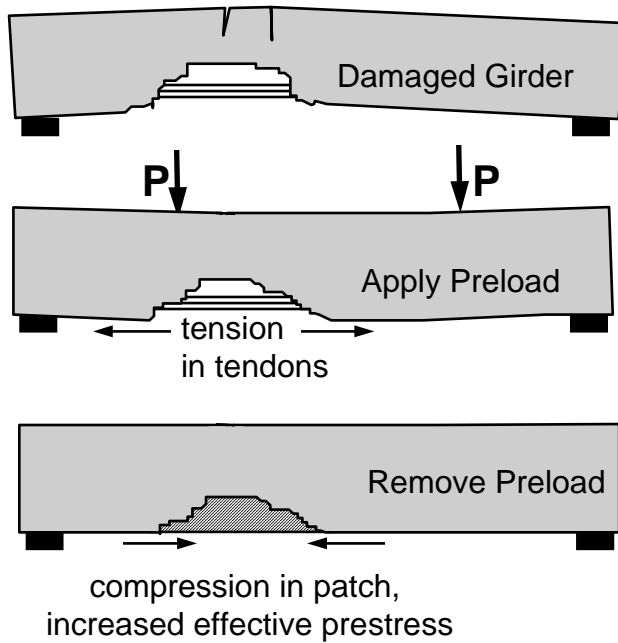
Example of applying preload to damaged girder to produce durable repair
